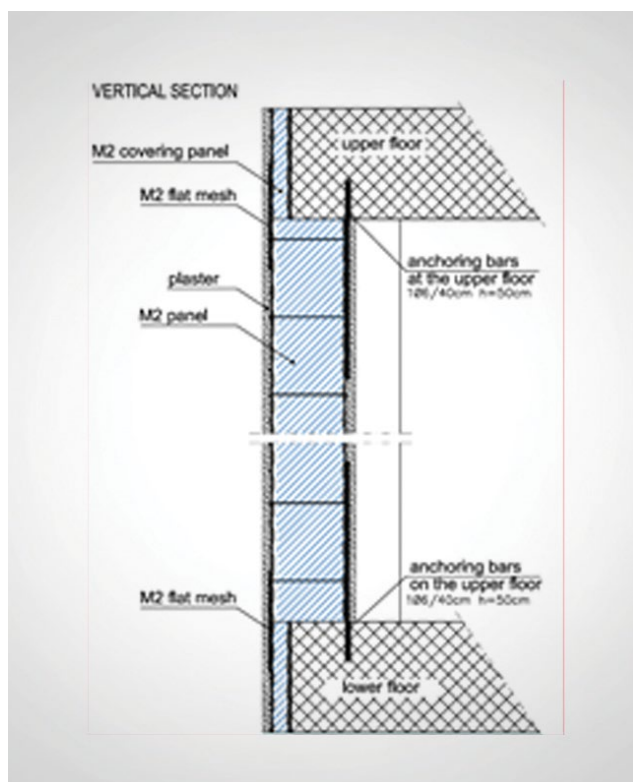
(b) Typical cross section of EPS sandwich panel
